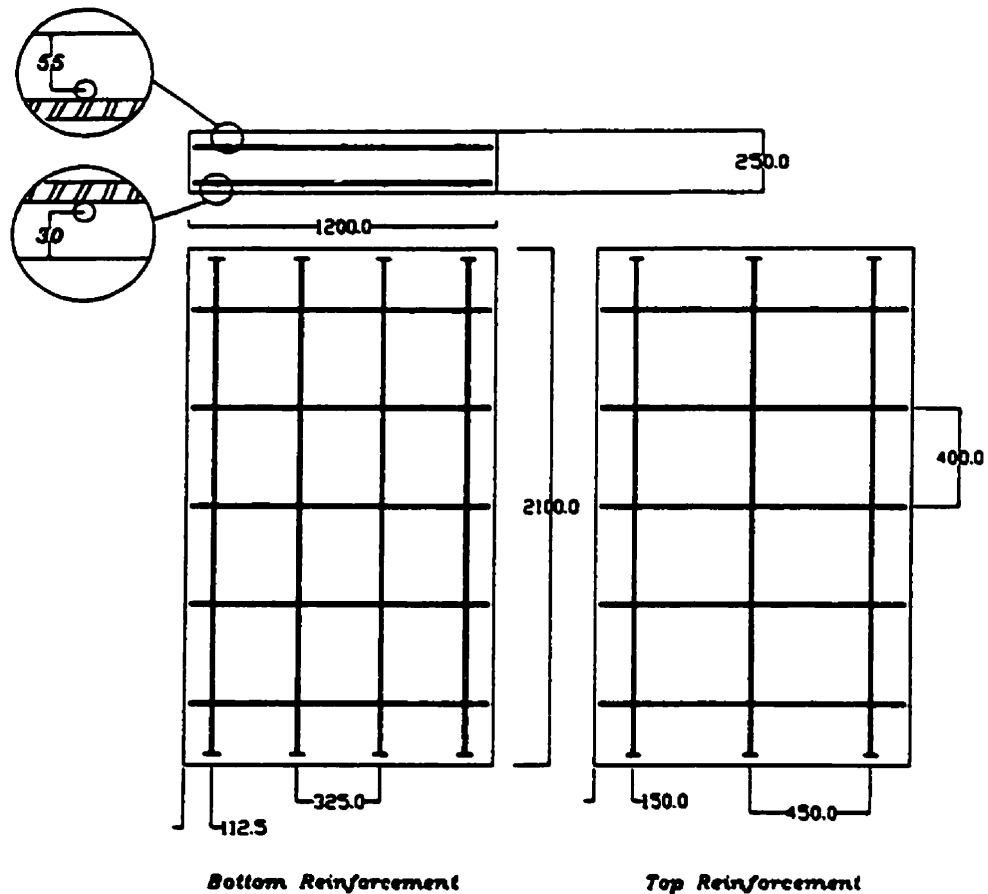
De Rose slab dimensions and reinforcement details [81]
